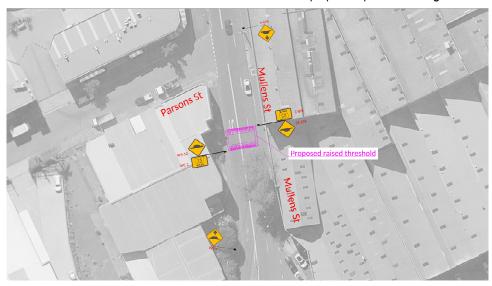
Mullens Street between Robert Street and Parsons Street proposal.
